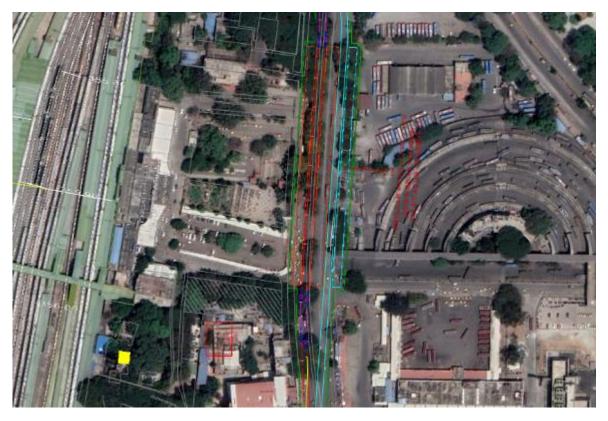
Proposed KSR Bengaluru City Station (SBC) on Site
